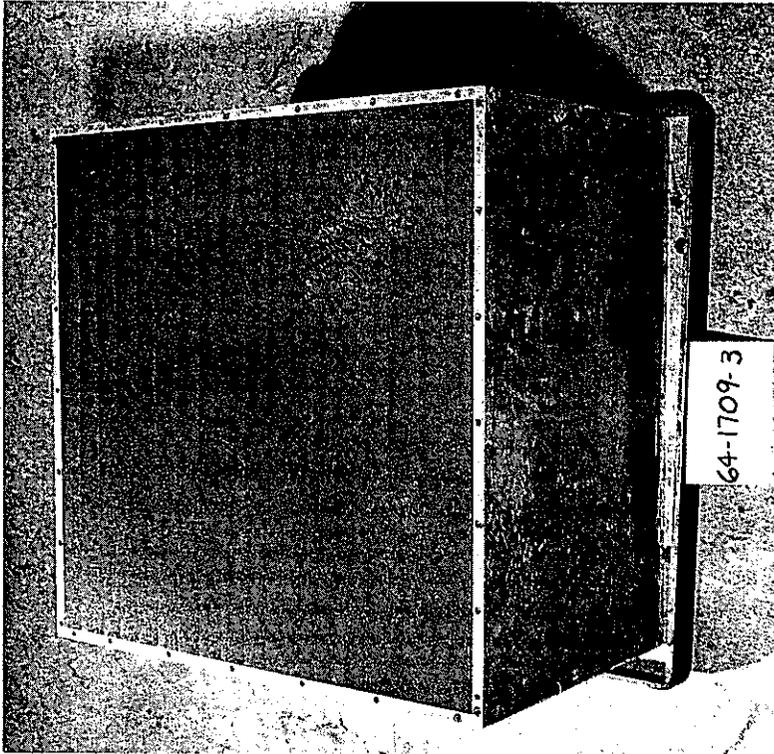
, Compaction Planes, Mold Turned and Side Removed.
